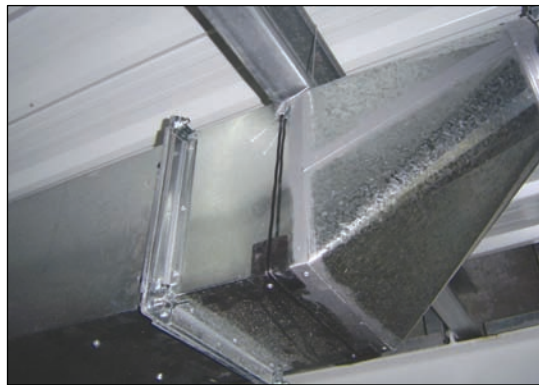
Rectangular ductwork suspended from a steel purlin. Wire rope and corner saddles have been used for this type of support.
